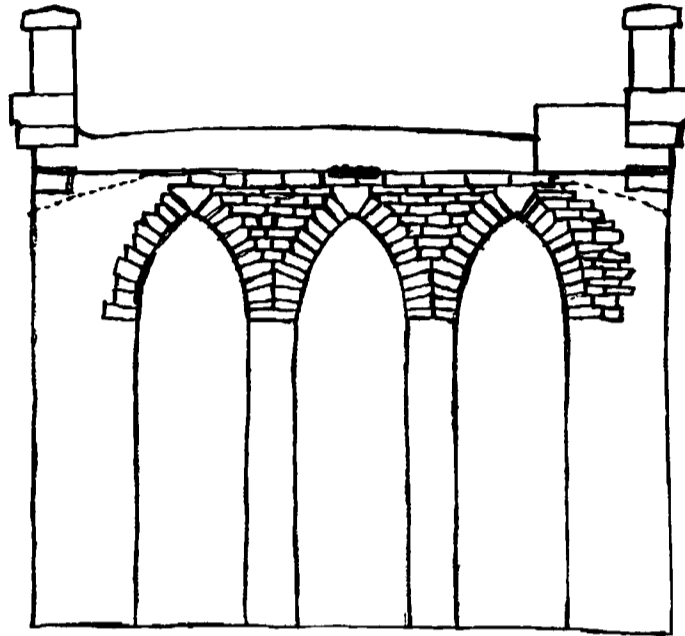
Section of hollow spandrels of Perth Bridge.
